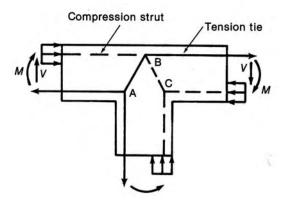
Beam-Column Joint Forces Based on Truss Model [6.26]
